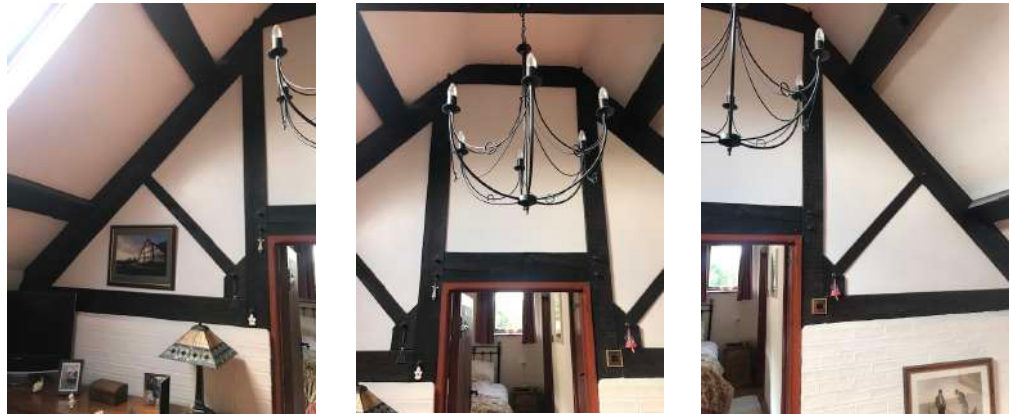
Truss 1 to the first floor south-bay, with altered tie beam to accommodate a doorway. The saw markings on the timbers suggest this is possibly a modern, machine-sawn replacement truss(?) (photo: ctd architects 2018)
